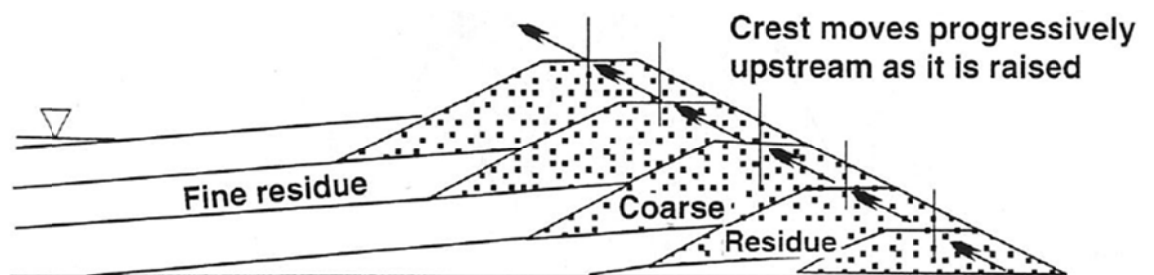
Section through a wall constructed upstream (CMSA, 1996)
